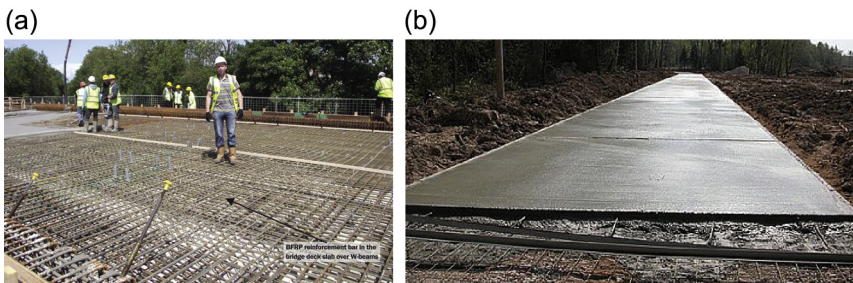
Bridge deck slab (http://magmatech.co.uk/downloads/Thompson_Bridge_Concrete_Magazine.pdf.) or road construction with basalt bars (<http://www.technobasalt.com/applications/item/road-construction-1/>.)
